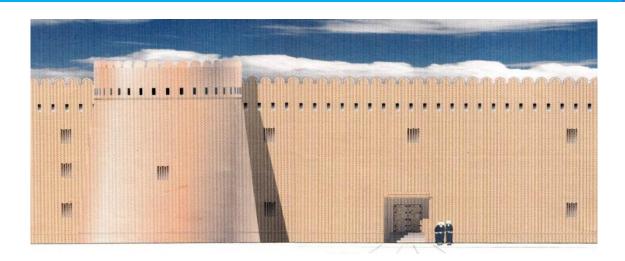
Planning to reconstruct the walls of "Deshan Kala" (layout)
